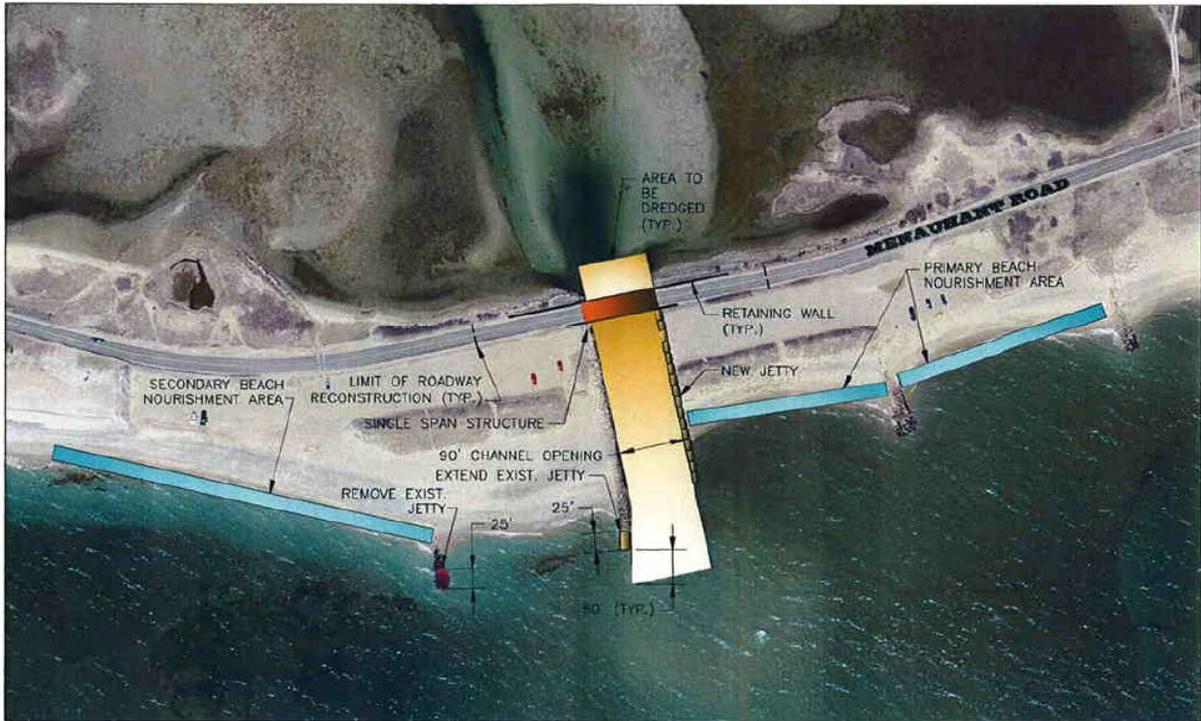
Proposed Plan for Widening the Bournes Pond Inlet
